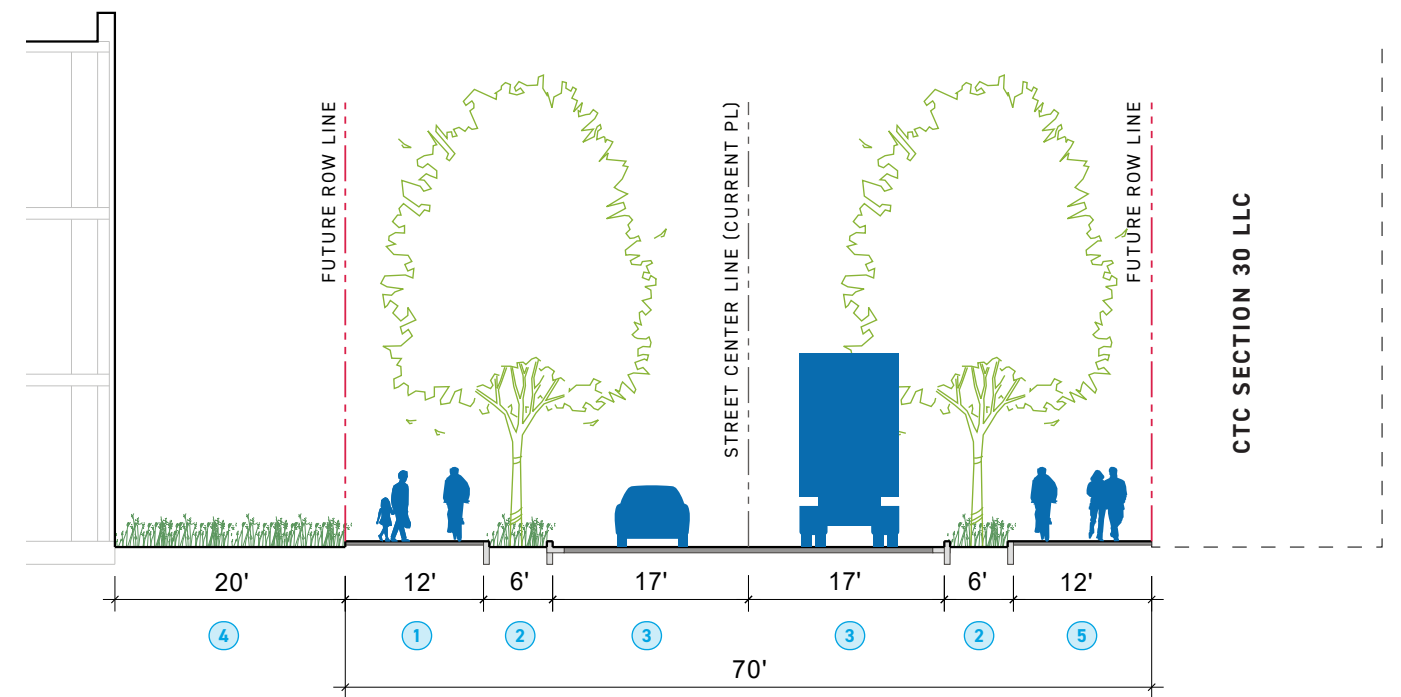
E - NE 184TH AVENUE STREET SECTION
